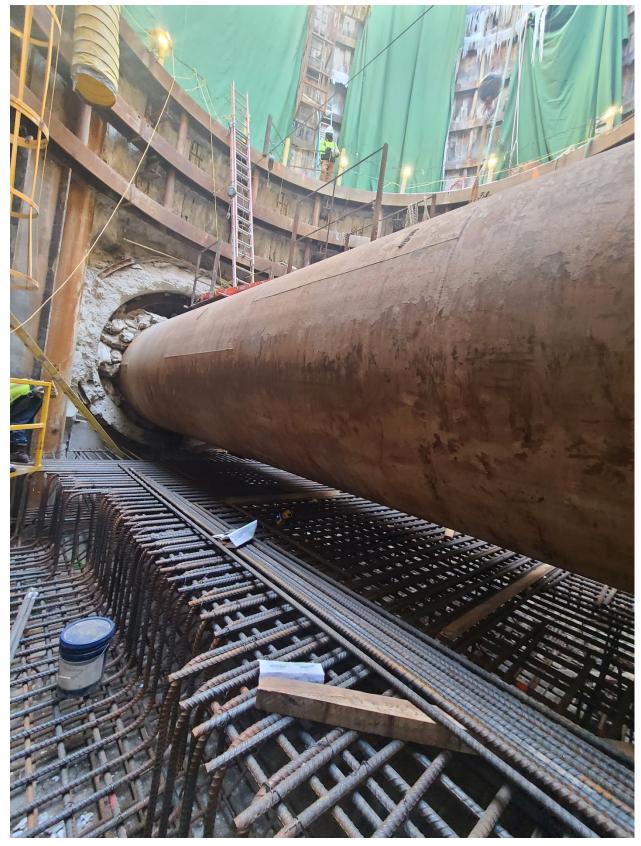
Installation of Rebar for the Base Slab of the Finished Structure
